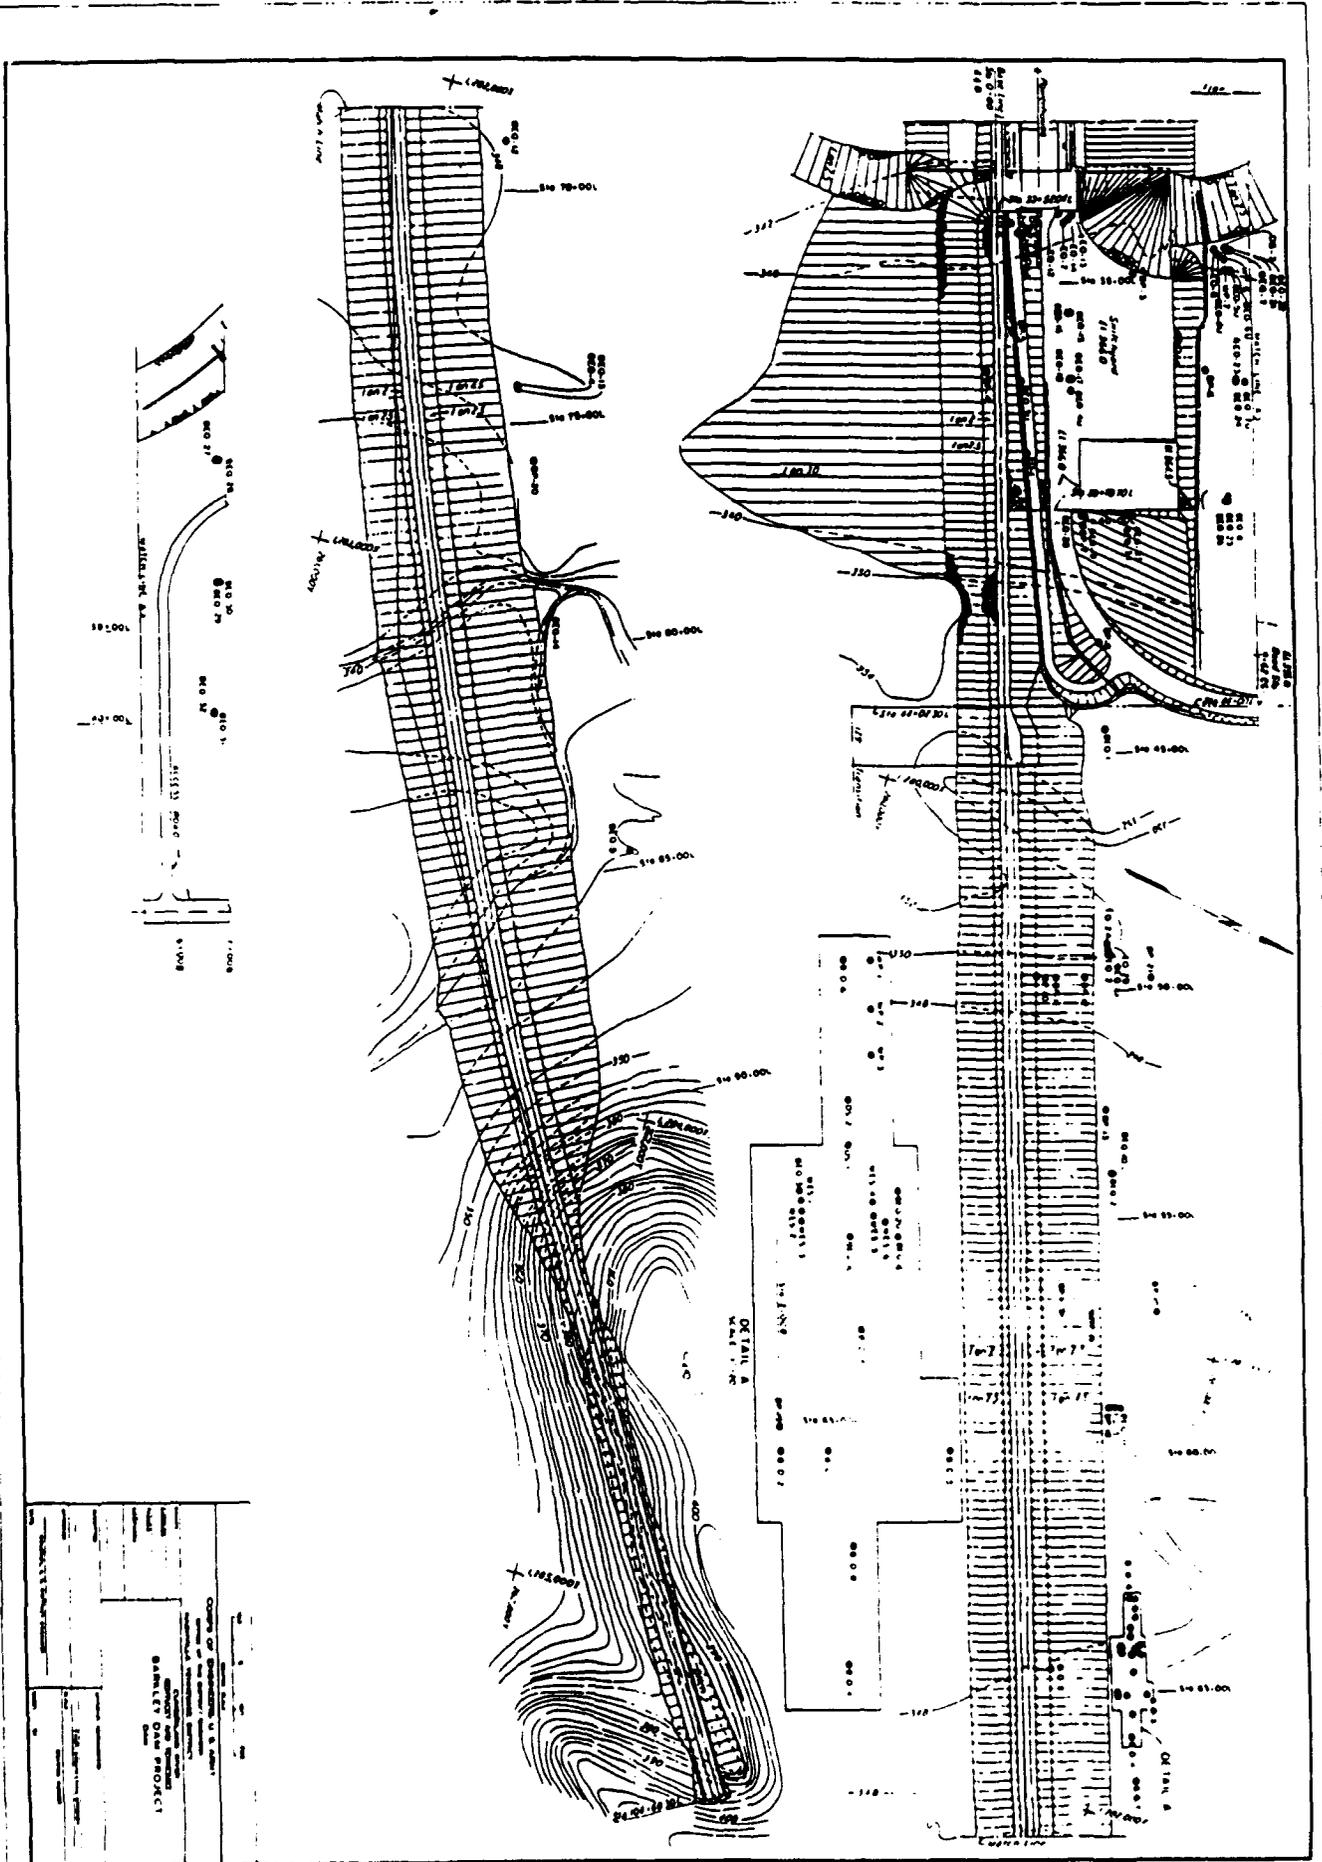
Plan view showing the locations of the borings used to recover undisturbed samples and SPT borings.
